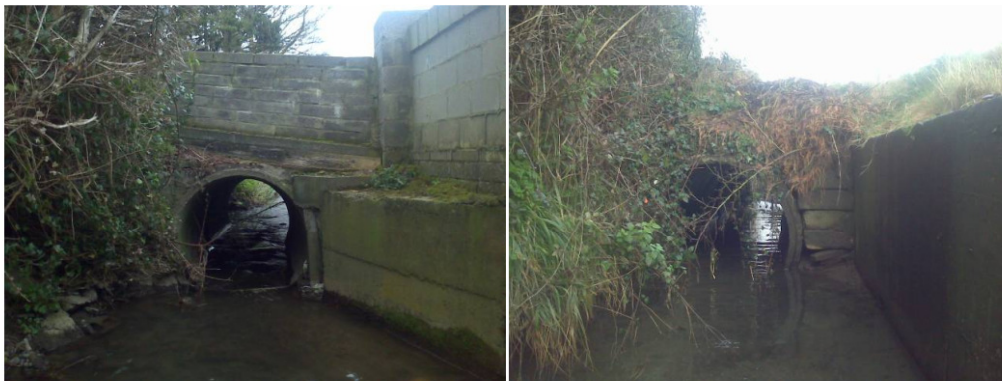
Culvert 09GRIF00880I (left) and culvert 09CARK00003I (right)
